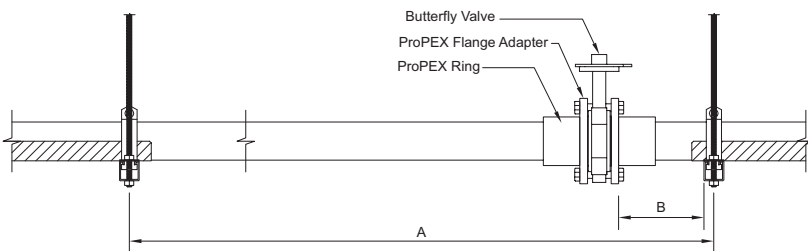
Supporting 2½" to 3" Butterfly Valves
